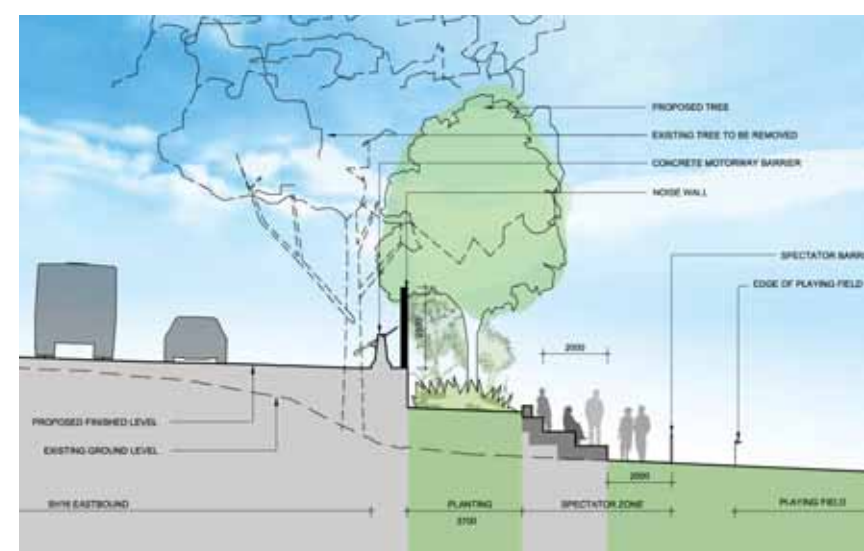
Northern boundary section at halfway line of main playing pitch
